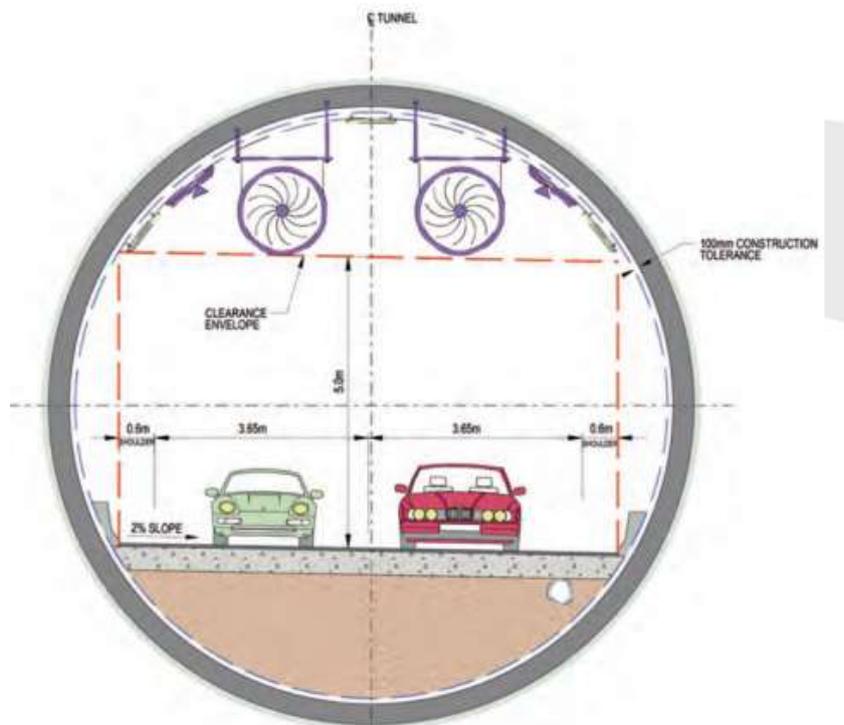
Example of Spaceproofing section for TBM –Bored road Tunnel
